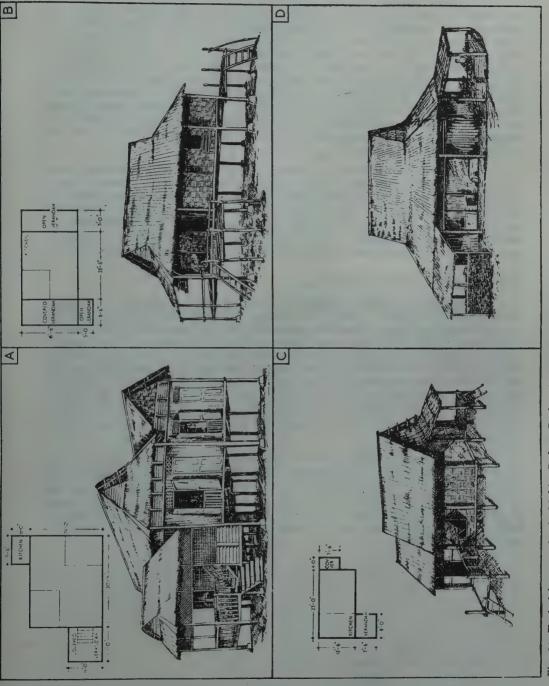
Typical house styles in Mukim Padang Pauh. A. Wooden-walled house with large windows, the dwelling of one of the wealthier farmers (type 1 of the text). B. Medium-sized bamboo- walled house, the most common style (type 2 of the text). C. Small shack inhabited by an indigent farmer (type 3 of the text). D. Shop-house.
